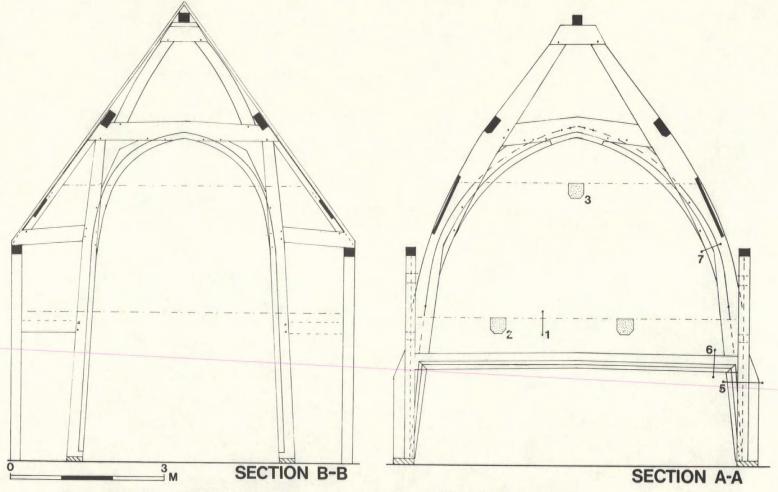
Moat Farm, Marston Mortaine. Section A-A, cruck truss; and B-B spere truss. Numerals refer to moulding details.
